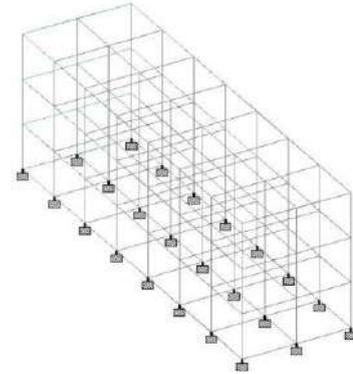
Short span (6m) model on STAAD Pro for Static Analysis
